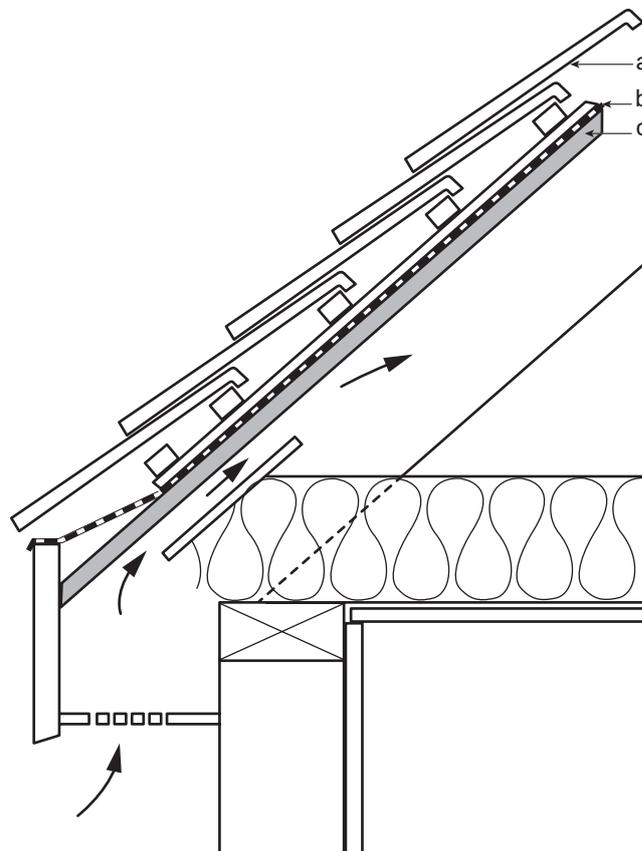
Example of a cold roof space with insulation at ceiling level. The roof space must be adequately ventilated
